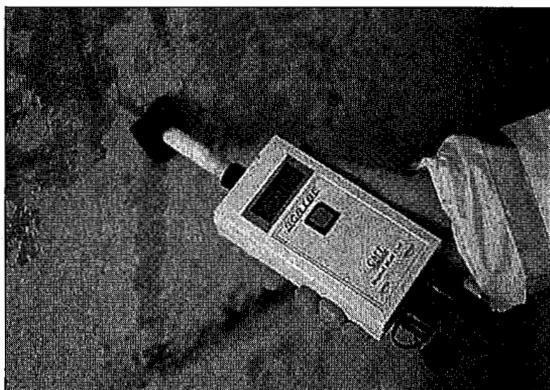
Half-cell potential testing equipment. (Courtesy of Hammond Concrete Testing, Ref. 3.)
